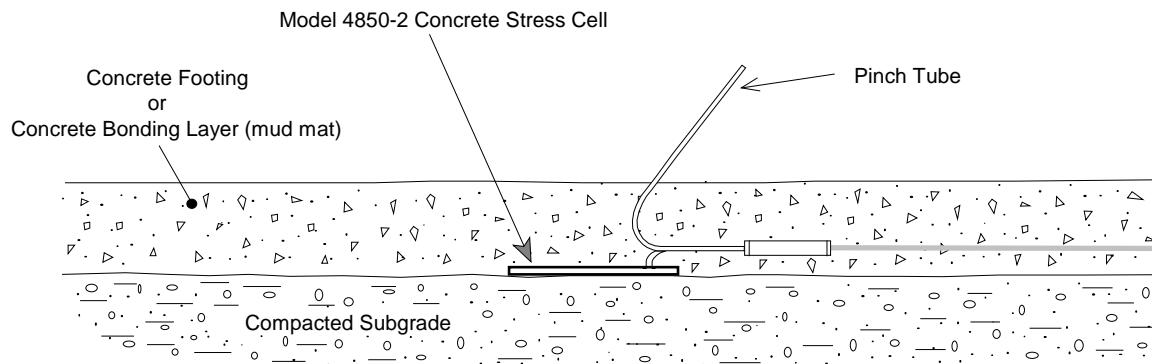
Model 4850-2 Concrete Stress Cell Installation
